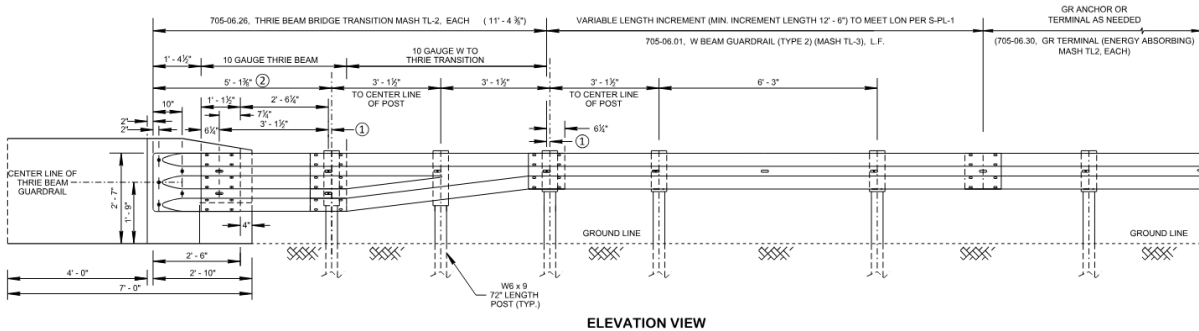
TDOT Guardrail Transition to Concrete Parapet for Low Speed Roadways – Standard S-GRC-6.
